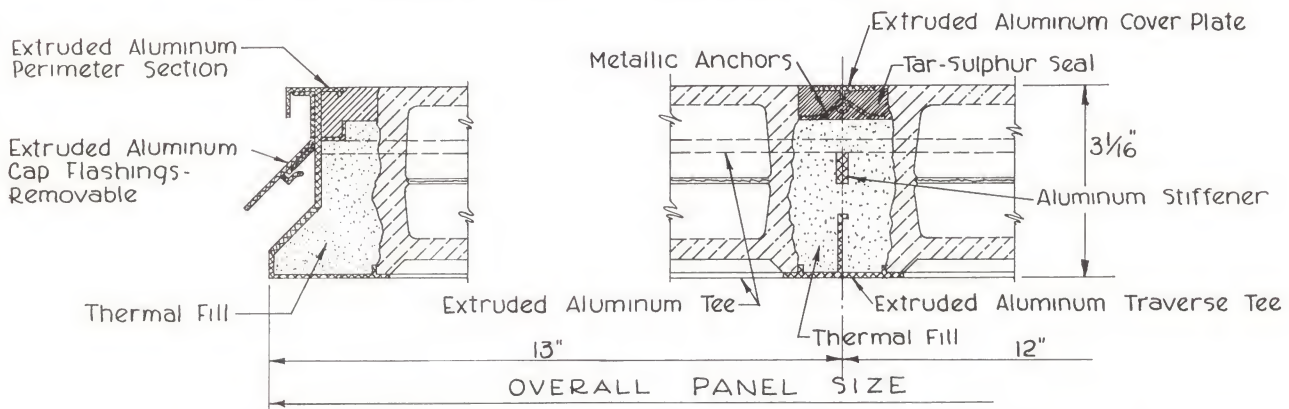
SECTION THRU OUTER PERIMETER BAR
